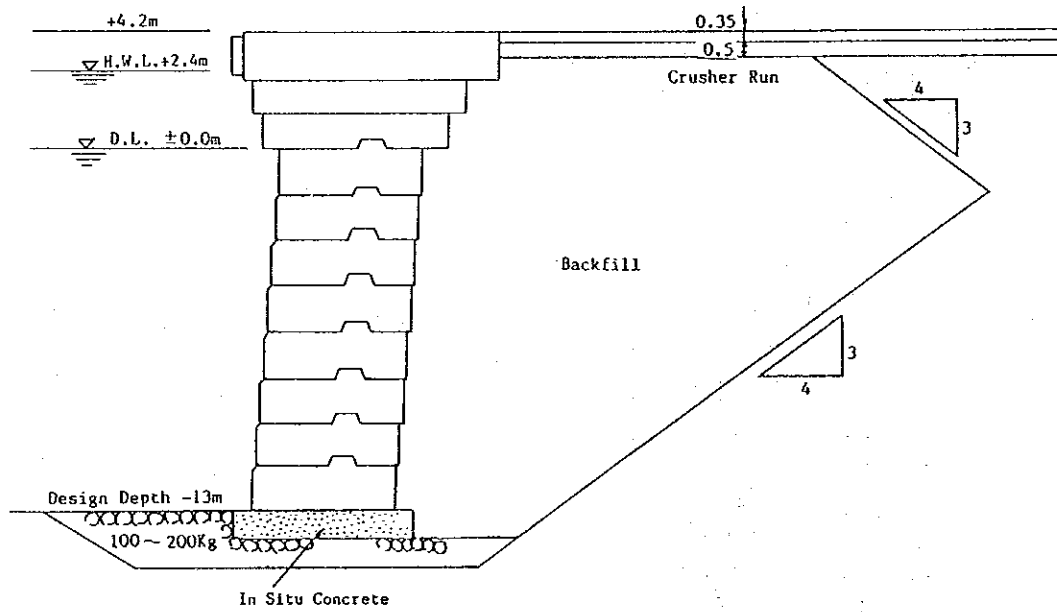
Proposed Cross Section of the Bank (-13m)
